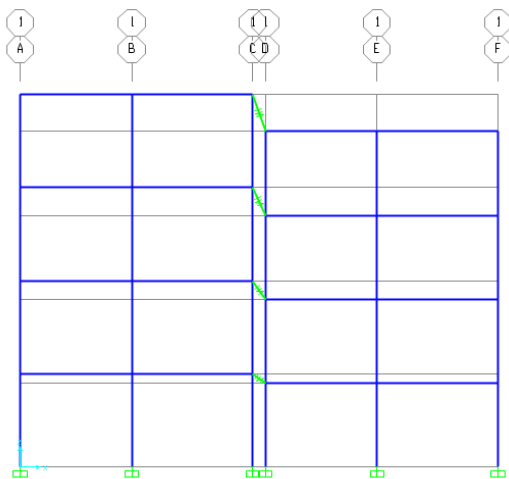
Common building plan adopted in Pokhara Metropolitan City taken for study
